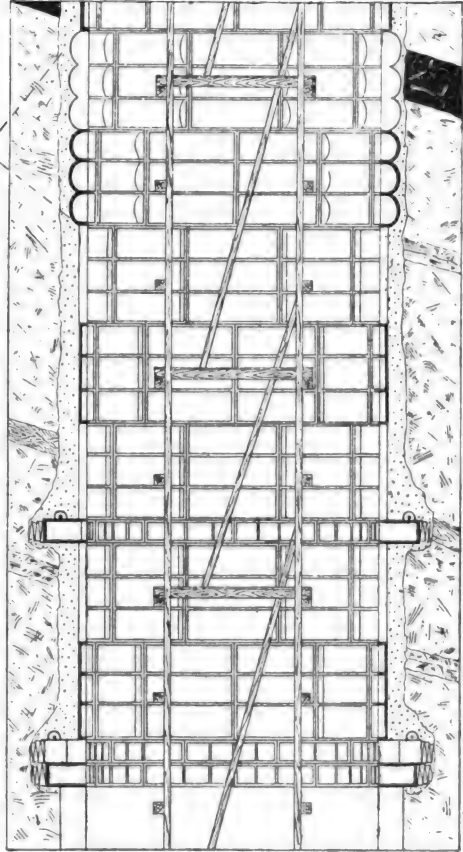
Corrugated Iron Tubbing in a Shaft at Eygelshofen.
